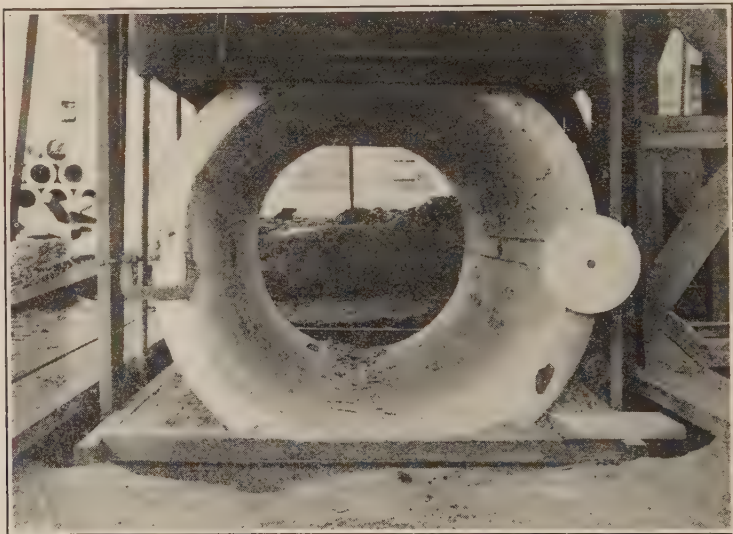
VIEW OF REINFORCED CONCRETE PIPE SHOWING FAILURE AT QUARTER POINT WHERE SINGLE LINE OF REINFORCING CROSSES NEUTRAL AXIS.
